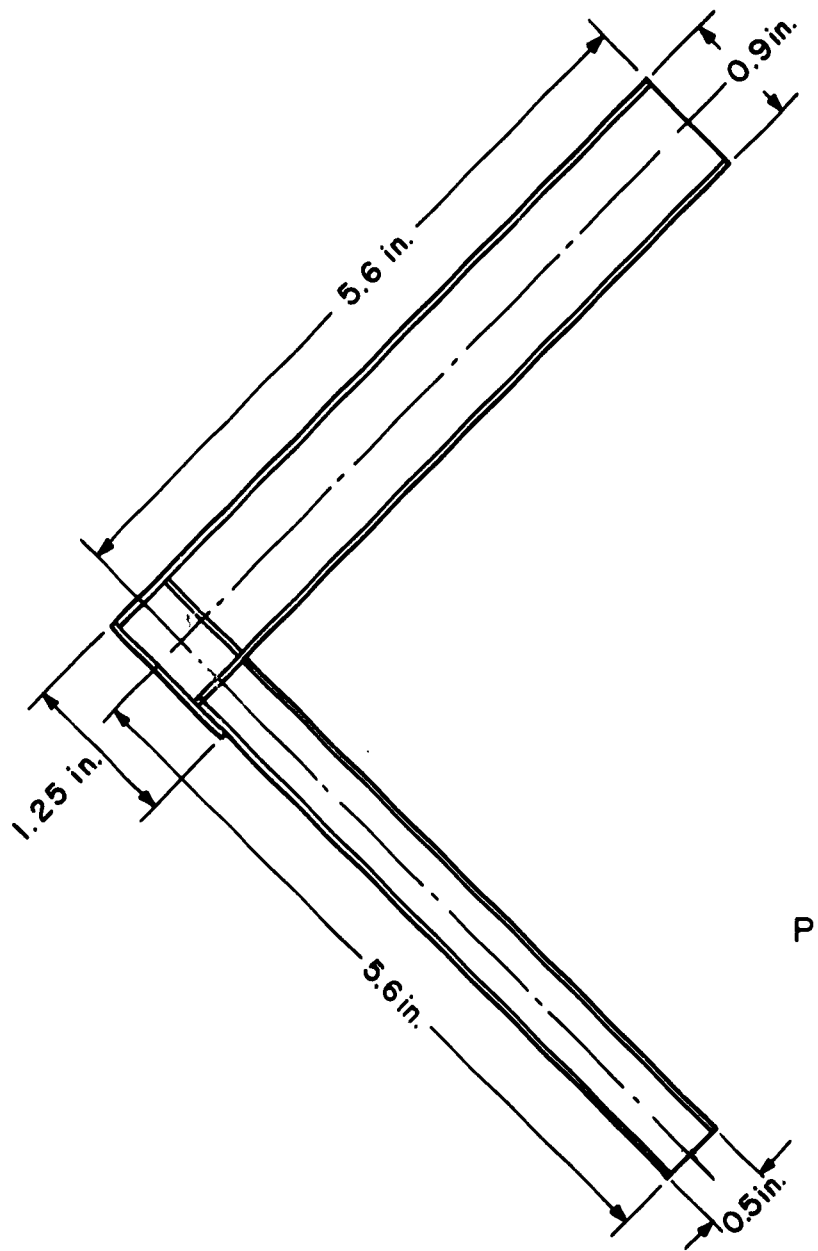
BEAM TO COLUMN MODEL CONNECTION
